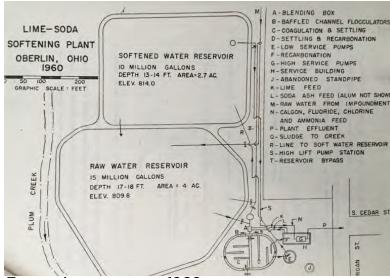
DIAGRAM OF 1960 WATER WORKS - PLAN VIEW
